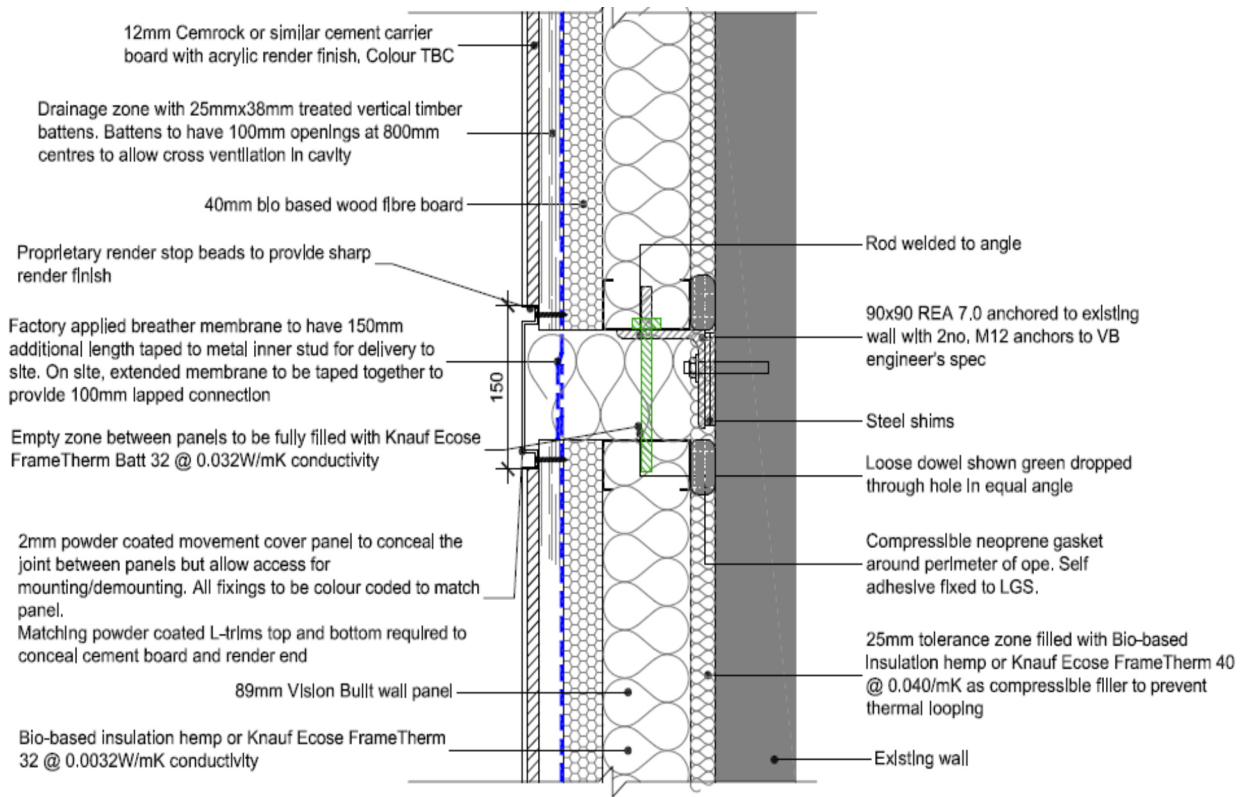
| Showing the horizontal panel-to-panel DfD connection at floor level that enables independent, non-stacked installation and full panel removal for reuse or further disassembly
